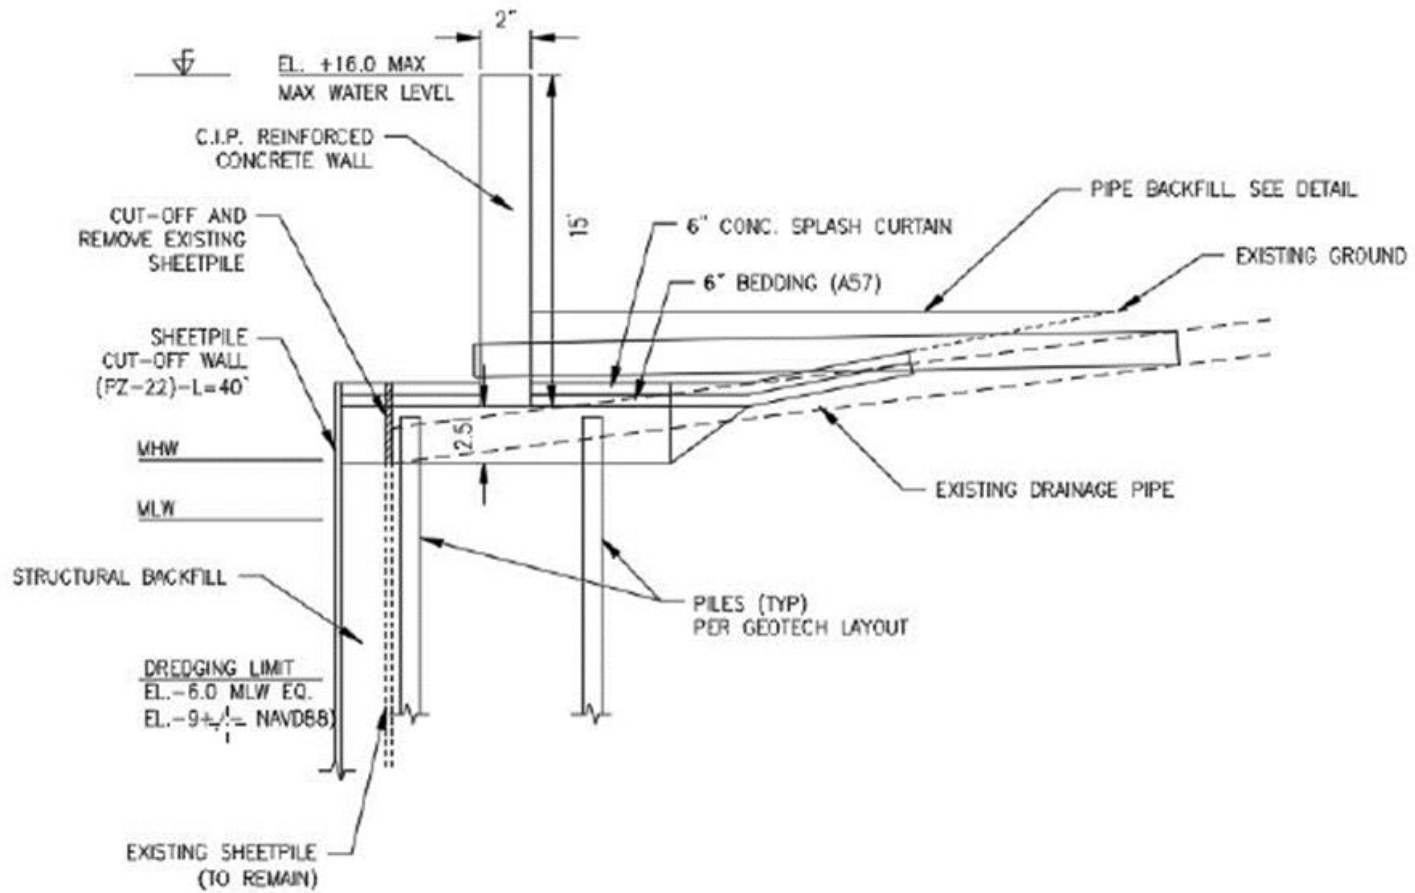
Typical Section Type C Cantilever Concrete Floodwall (Perimeter Plans)
